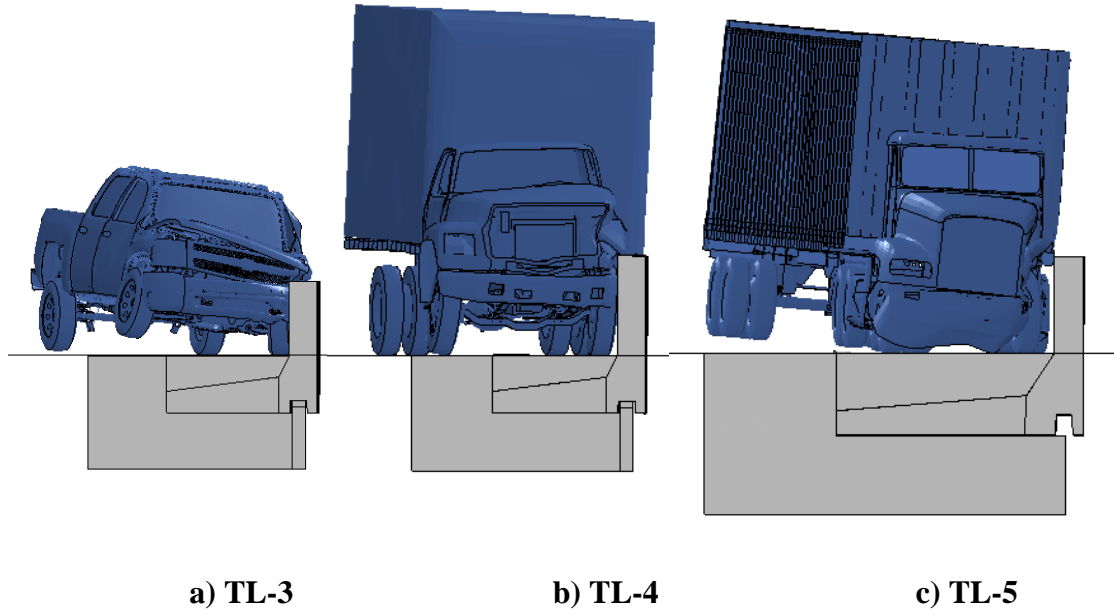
Sketch of FE models on barrier-moment slab systems
